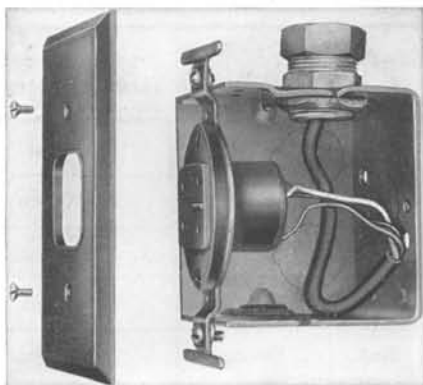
497A JACK MOUNTED IN OUTLET BOX
